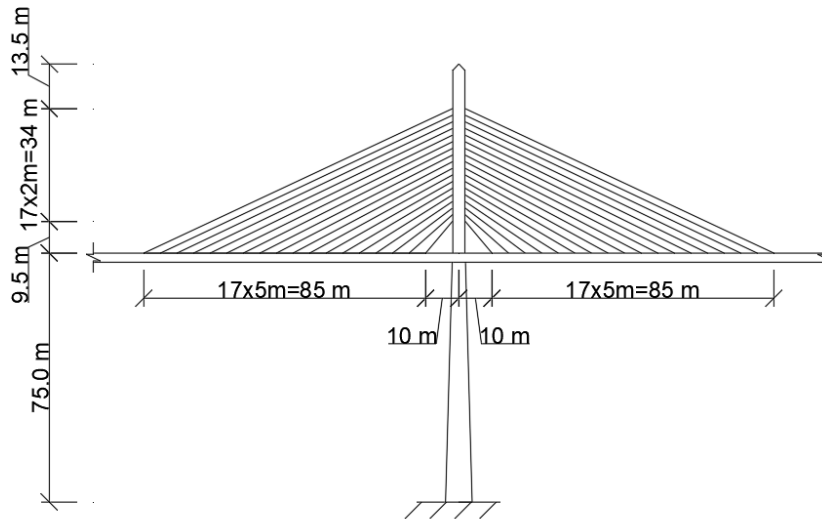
View of cables falling on the right and left side of the bridge pylon
